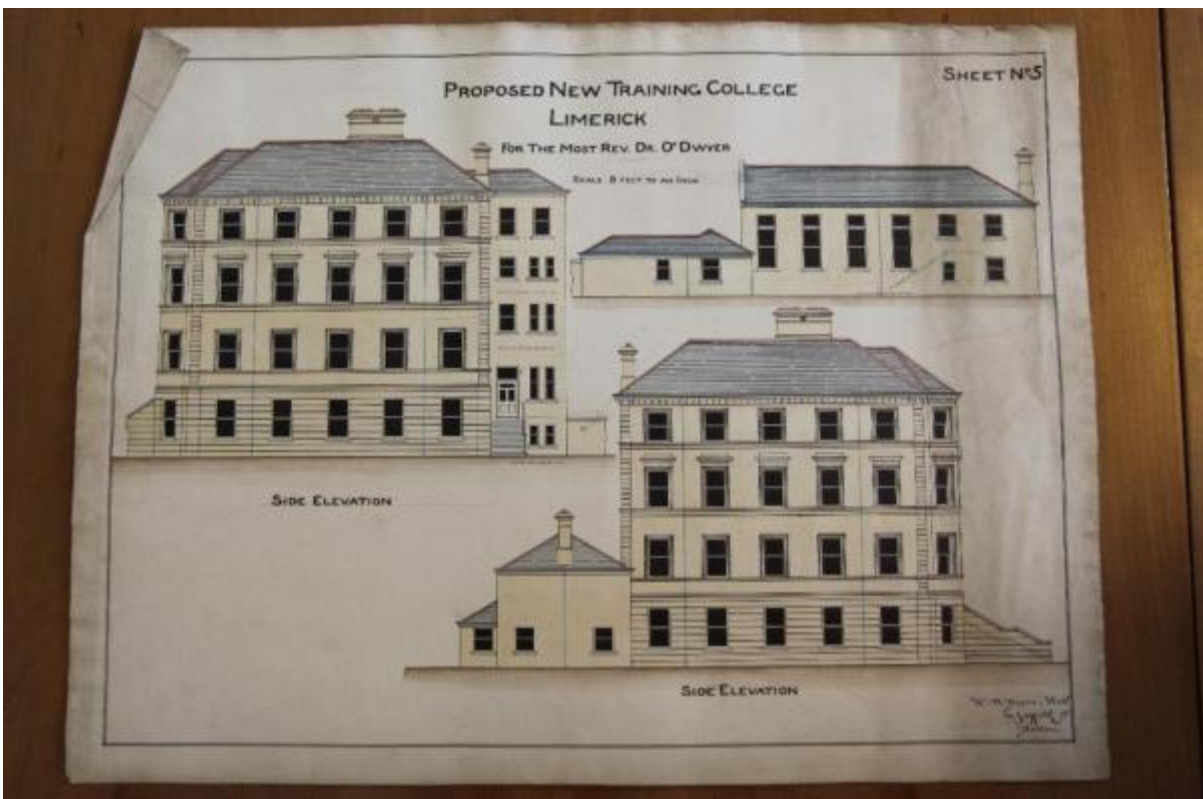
Mary Immaculate College Elevations drawing - Irish Architectural Archive
